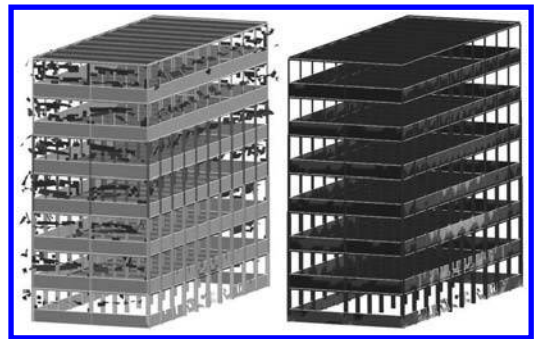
Damage caused by a 100kg-10m explosion. (left) glass and concrete façade; (right) damage to concrete façade.
